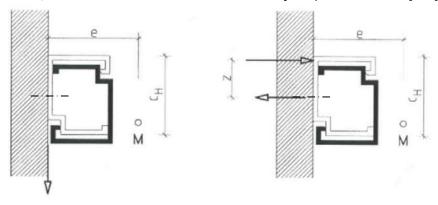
torsion of horizontal load-bearing profiles resulting from dead load of the façade panels
